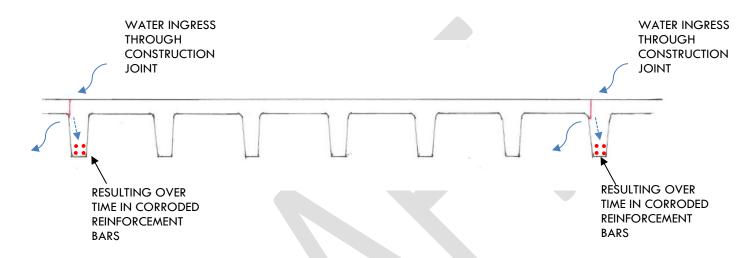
Typical section through floor slab: water ingress through construction joints (every 6th or 7th rib) with the potential to result in corrosion of the rib reinforcement
